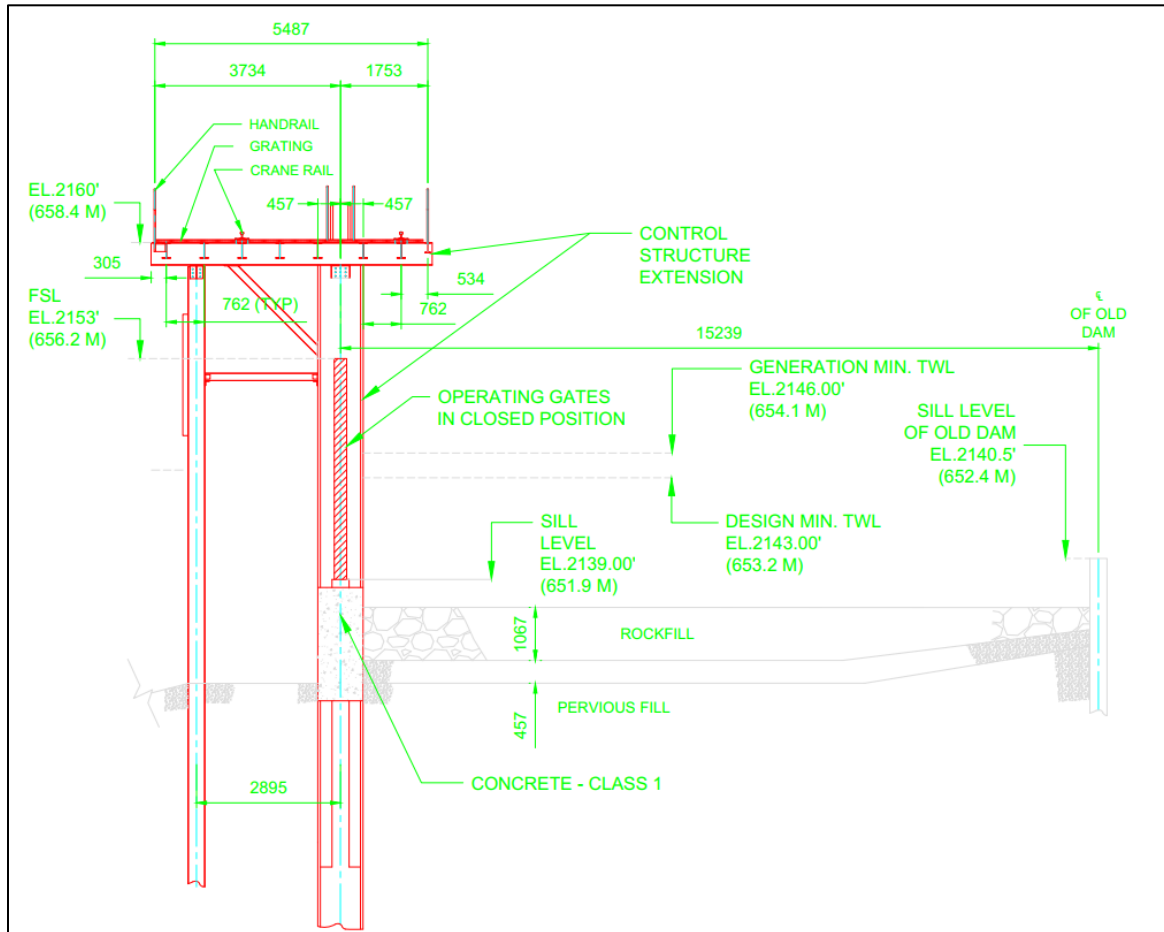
Cross Section View of Lewes Control Structure and Old Dam Sill (Conceptual Drawings – Stantec)
